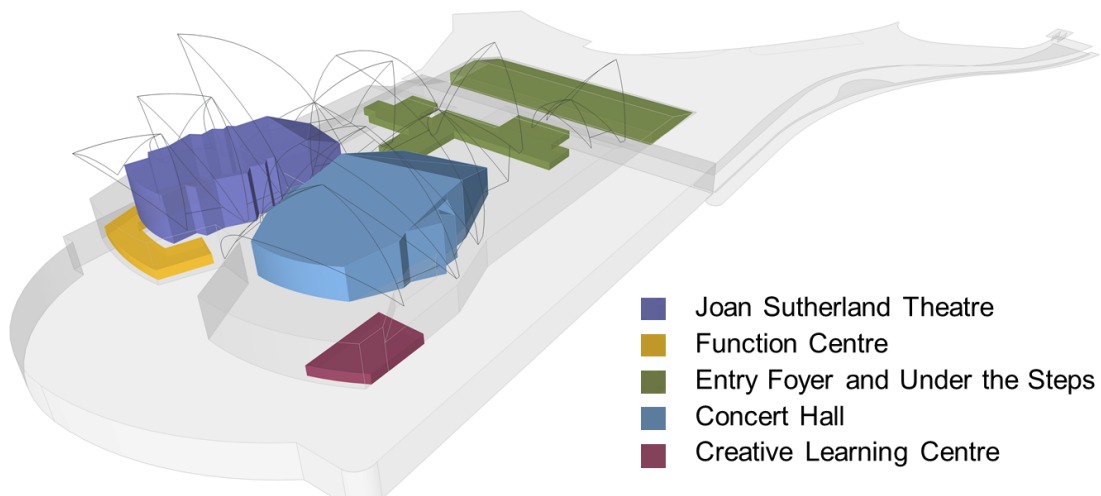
Sydney Opera House Building Renewal Program (Source: Sydney Opera House Trust)
